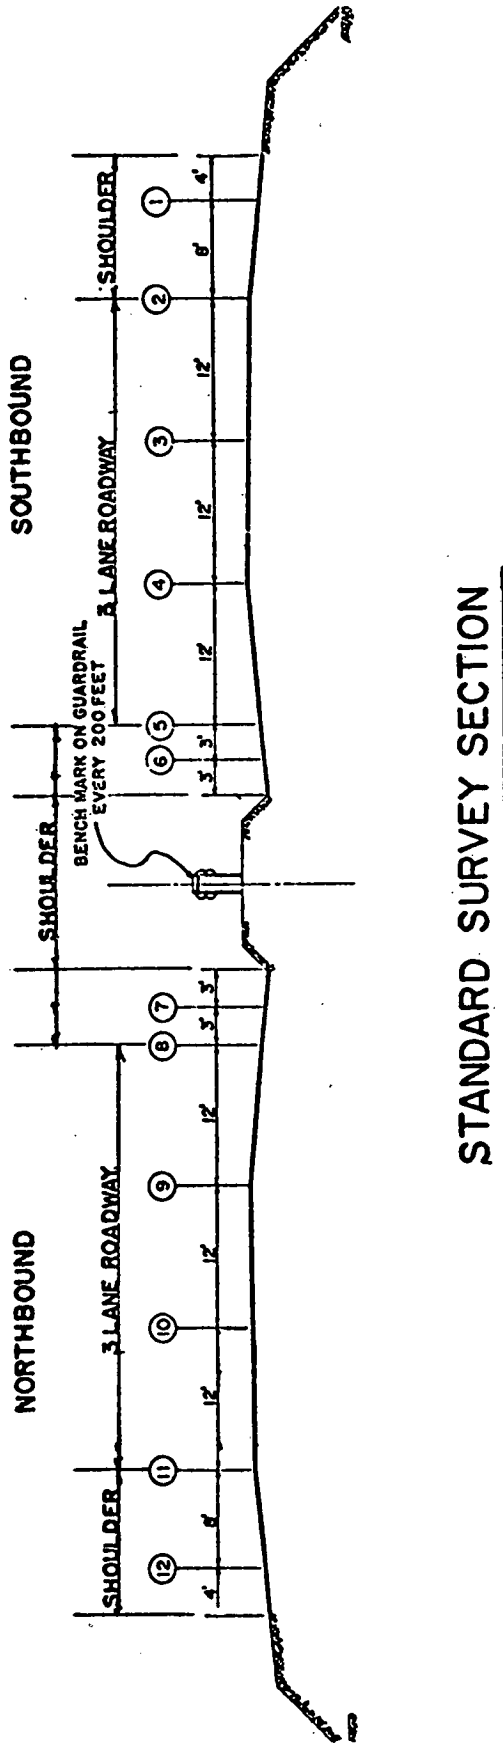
Survey section and bench mark location details for New Jersey Turnpike field survey to prepare plans for pavement resurfacing and correction of irregularities.
